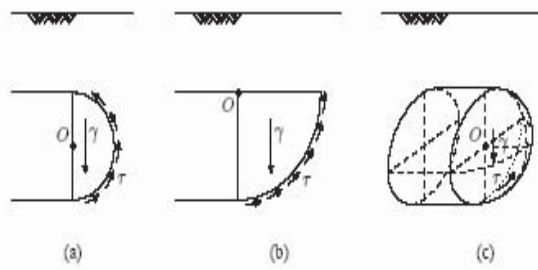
The various modes of instability as assumed for the tunnel face in the method of Krause.
